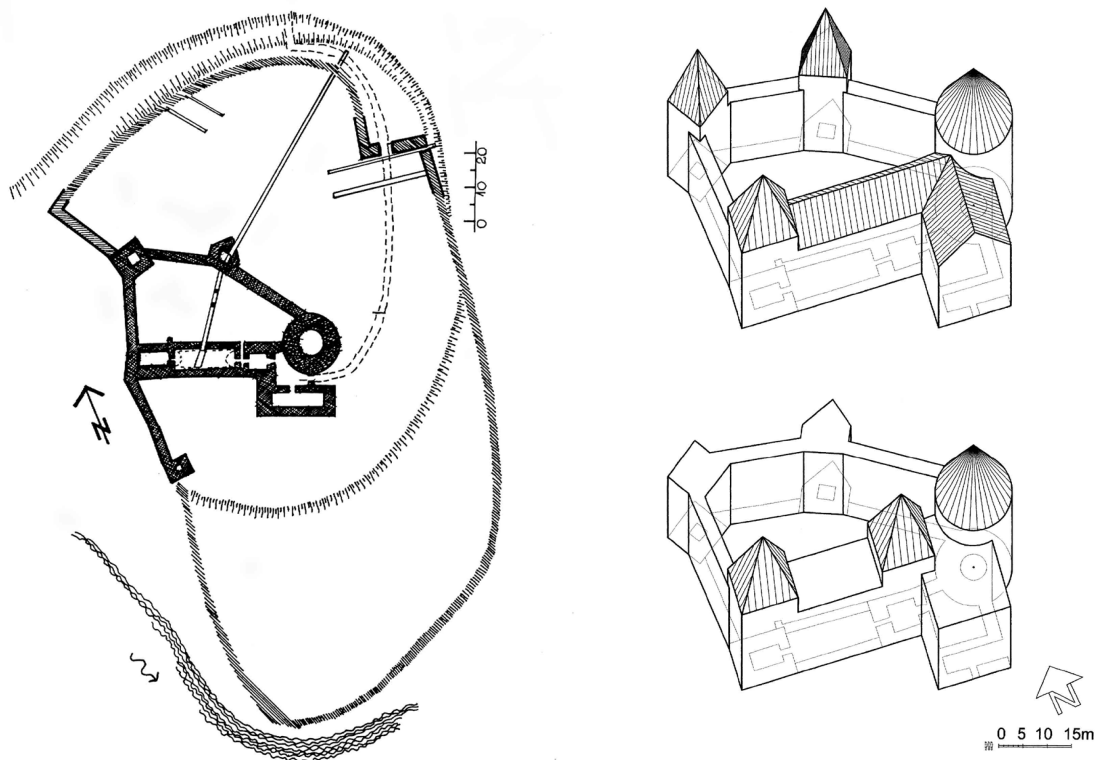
Plan and Reconstruction of Sand Ladislaen.
